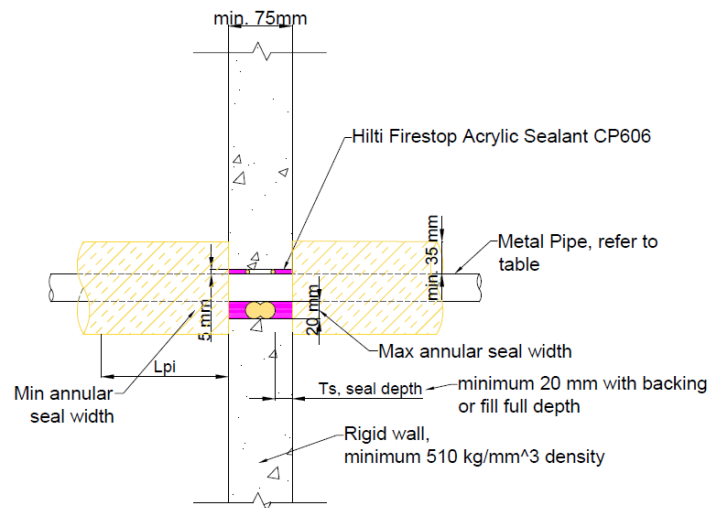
Side view – 120 mins FRL rigid wall system with or without mineral stone wool
